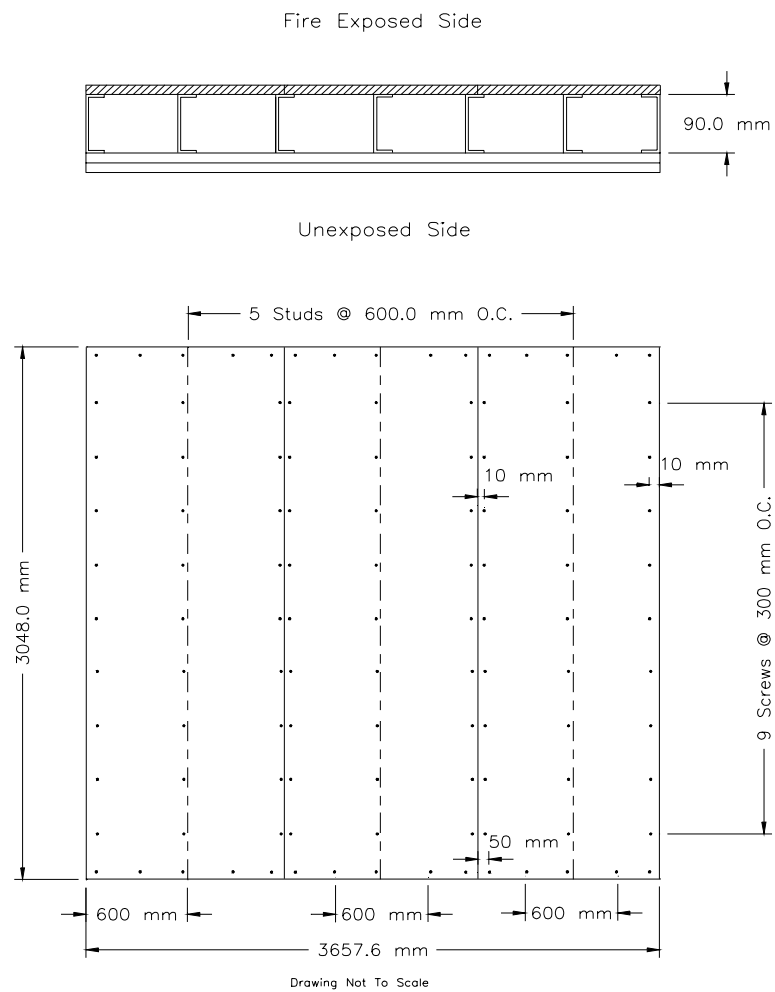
Screw Locations For Steel Stud, 1x2 Gypsum Board Layers,
